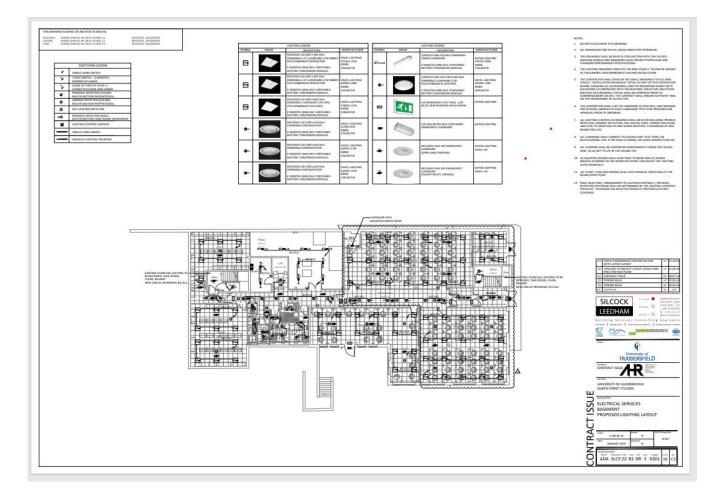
Electrical Services Basement Proposed Lighting Layout (Percy Shaw House Building).
